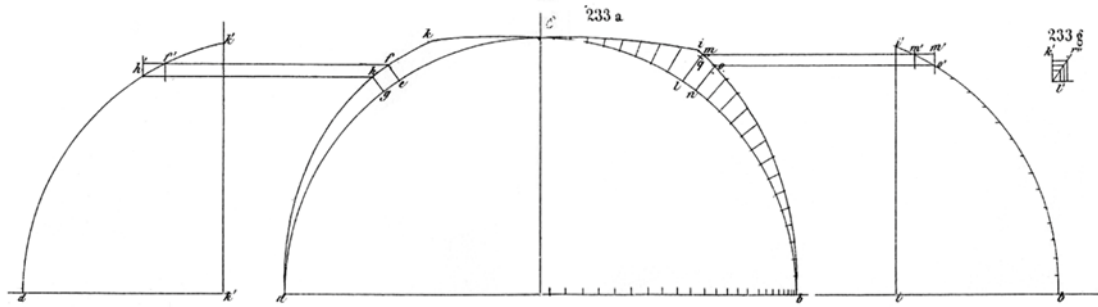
Disposition of bed joint planes according to Georg Ungewitter (1859: Plate 8)
